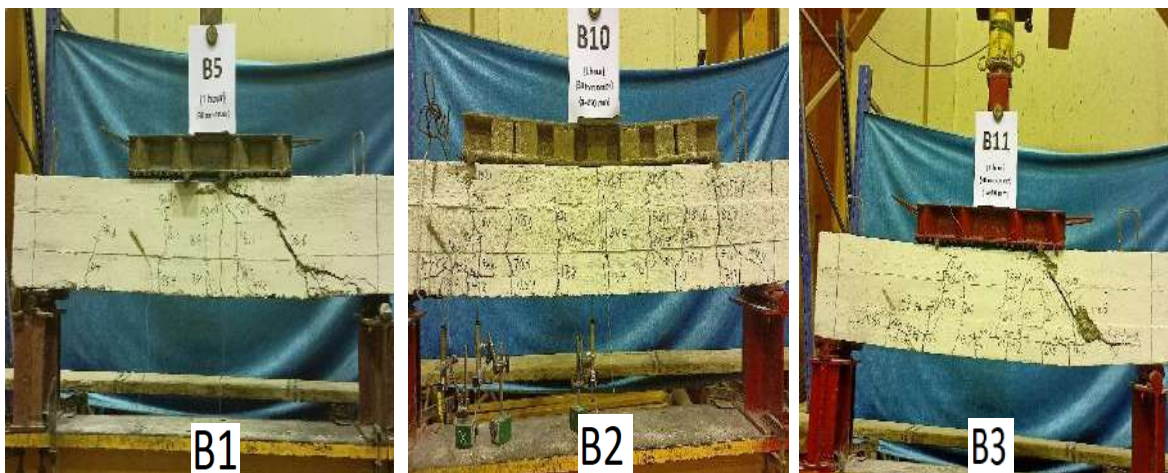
Crack pattern and Failure Mode of Tested Beams.
